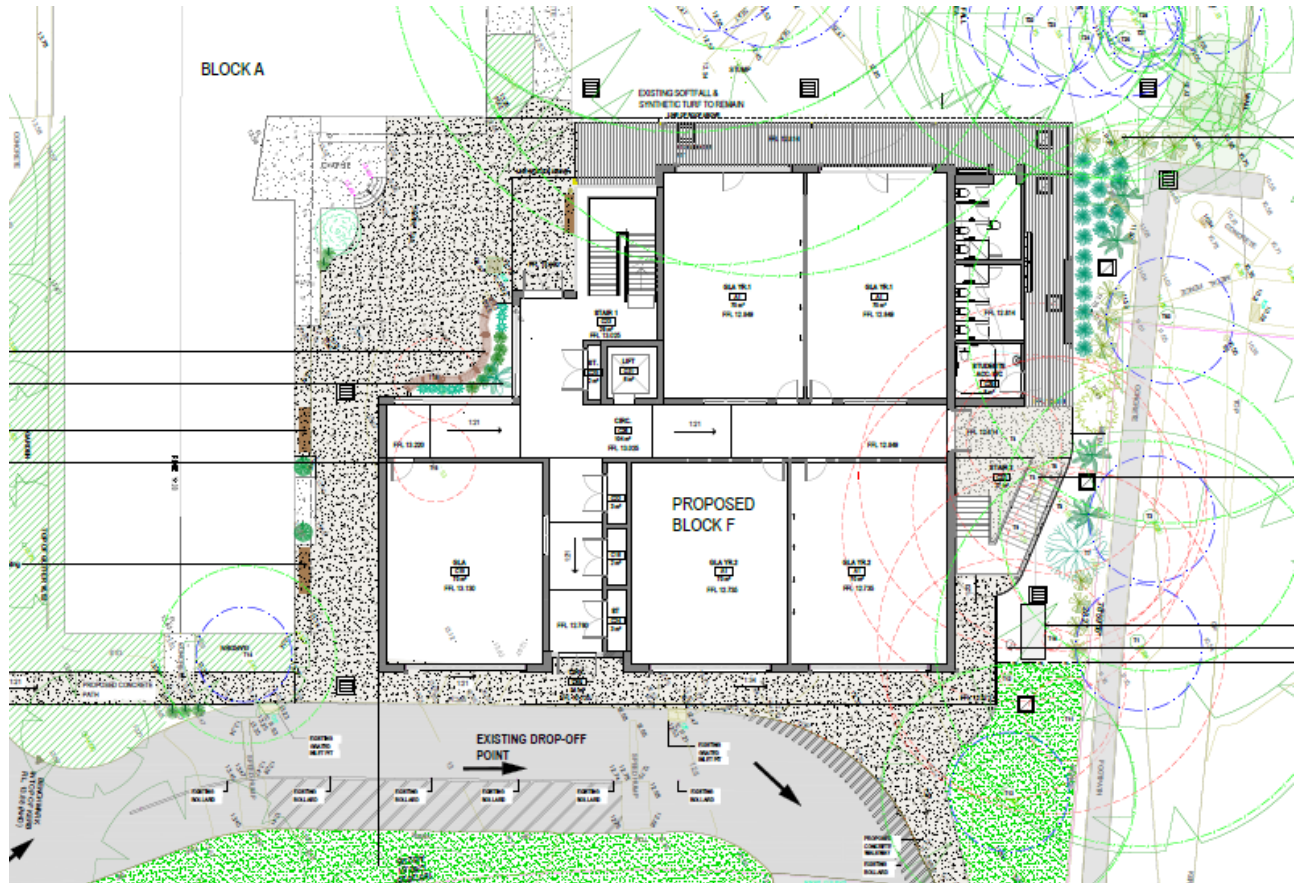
Proposed Landscape Design (Source: Space Landscape Design)
